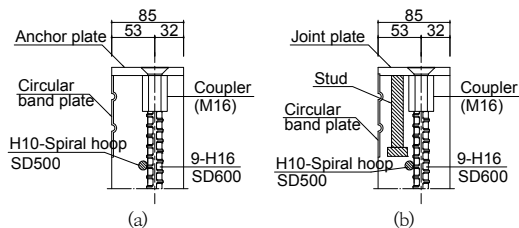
Diagram of the joint plate (a) Anchor plate and (b) Joint plate
